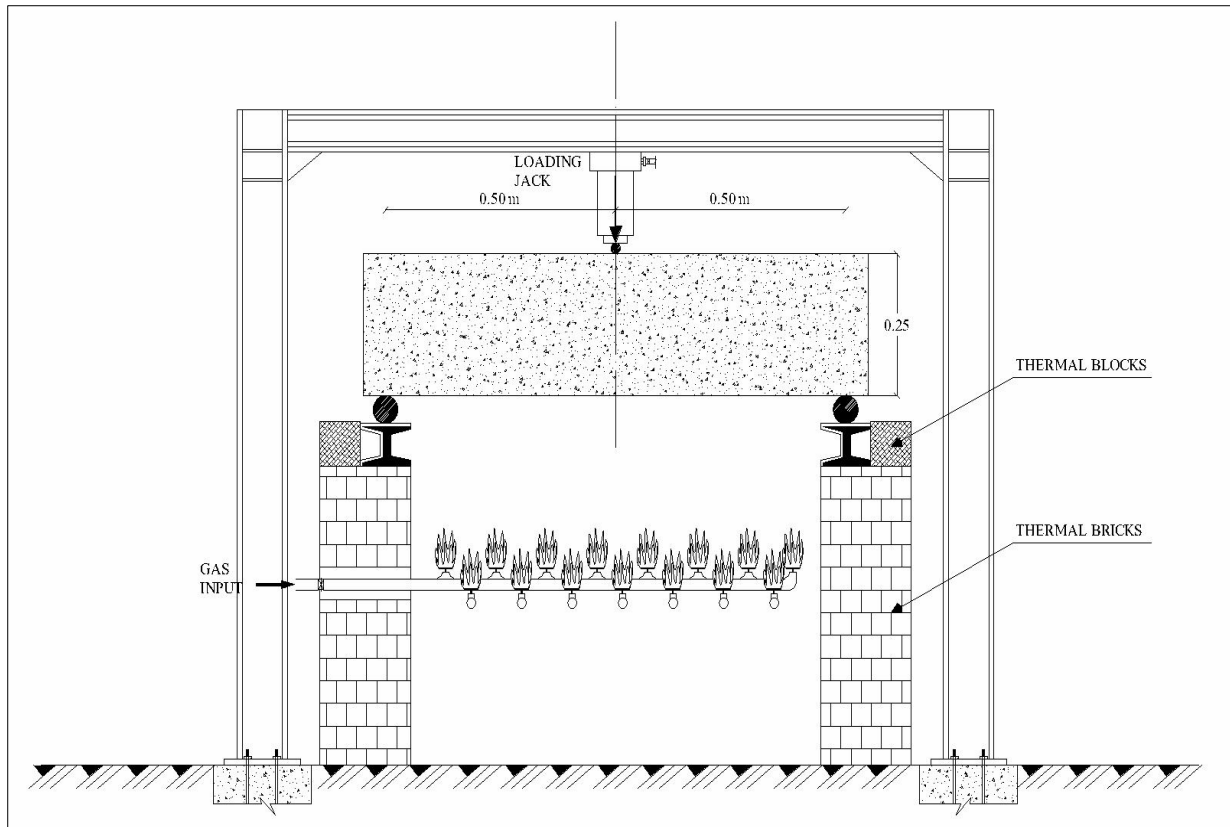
Test setup for measuring resistance to fire of slabs made from glass-reinforced concrete (Sadek, et al., 2006)
